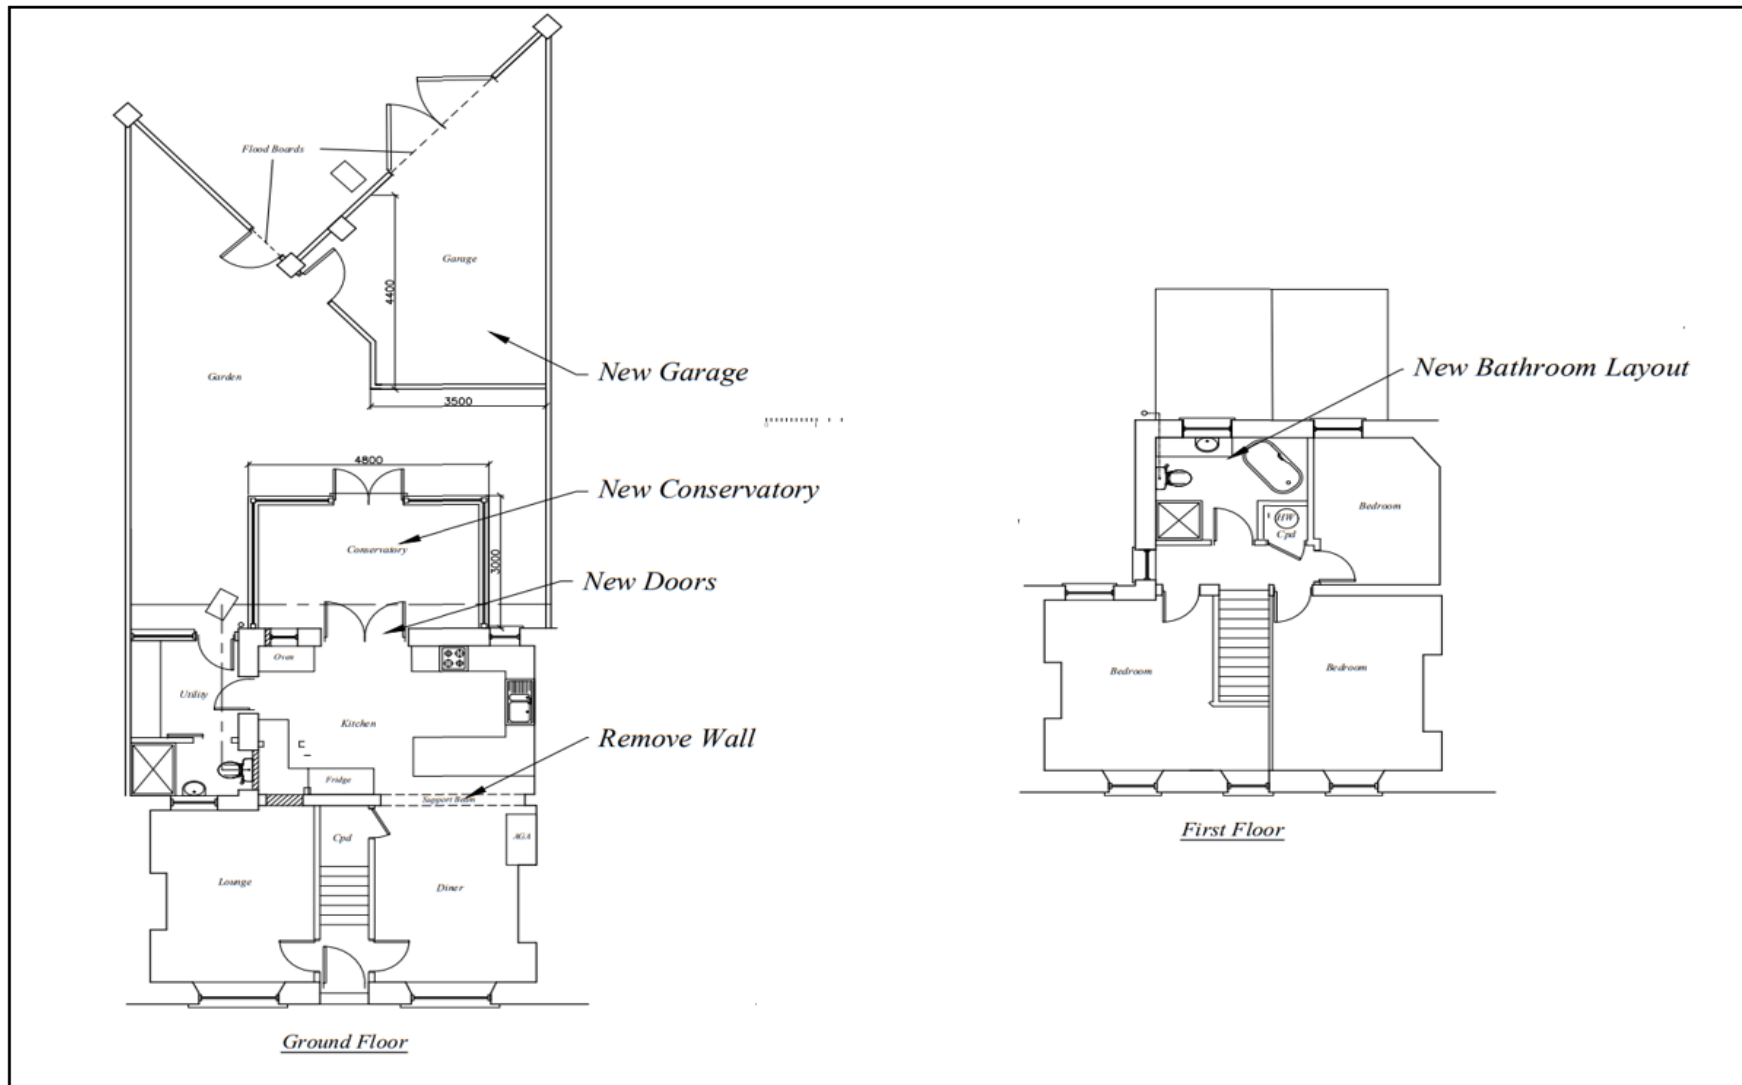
Proposed ground-floor and first-floor plans of St Eia (Paul Osborne).
